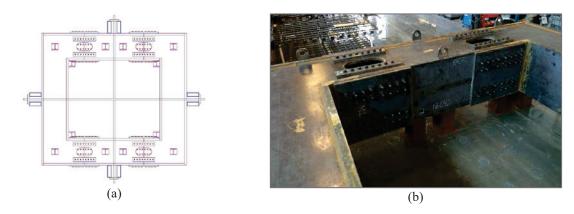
(a) Confinement steel frame design. (b) Picture of steel frame used on confined specimen.
